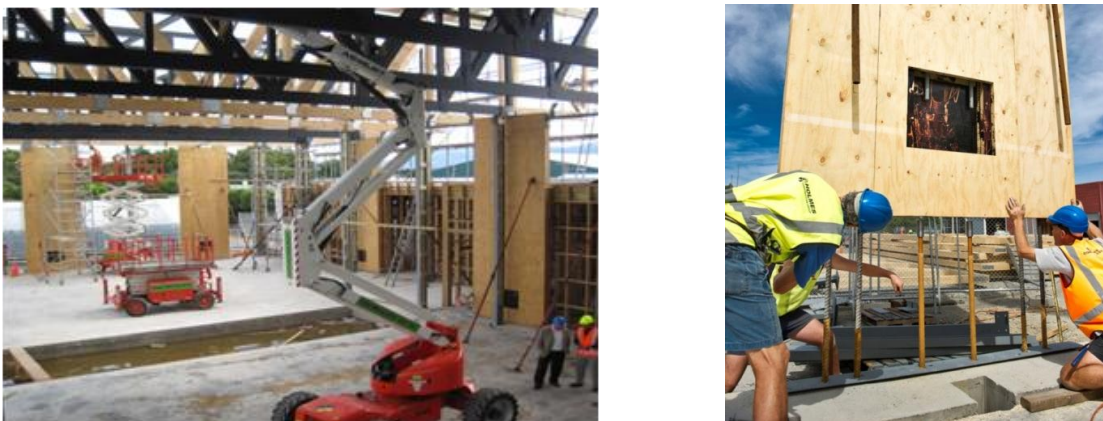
Carterton Events Centre. Single-storey building with LVL truss roof. (Designed by Opus International: Dekker *et al.* 2012).
